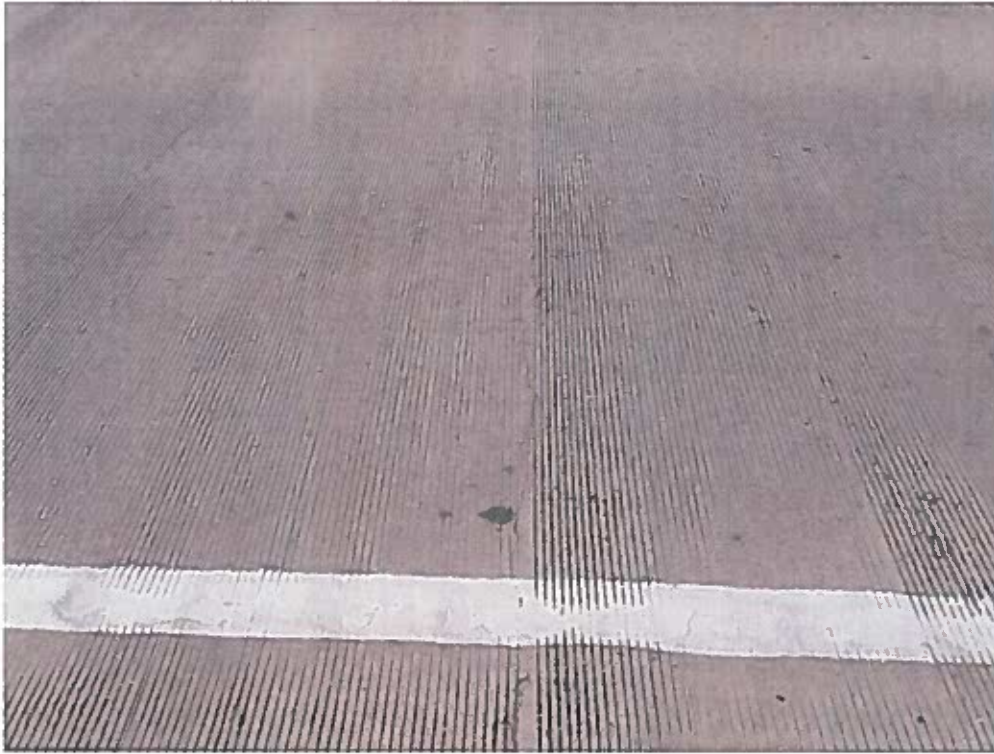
TYPICAL CONDITION OF TOP OF DECK. NOTE CRACKING.
